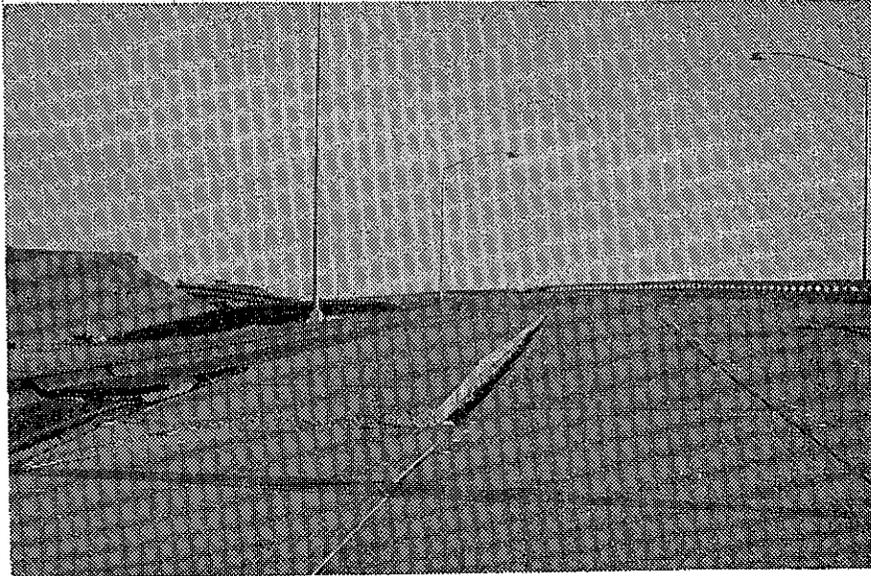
Looking southeasterly along Connector D-Y, at damaged fill-supported pavement.
